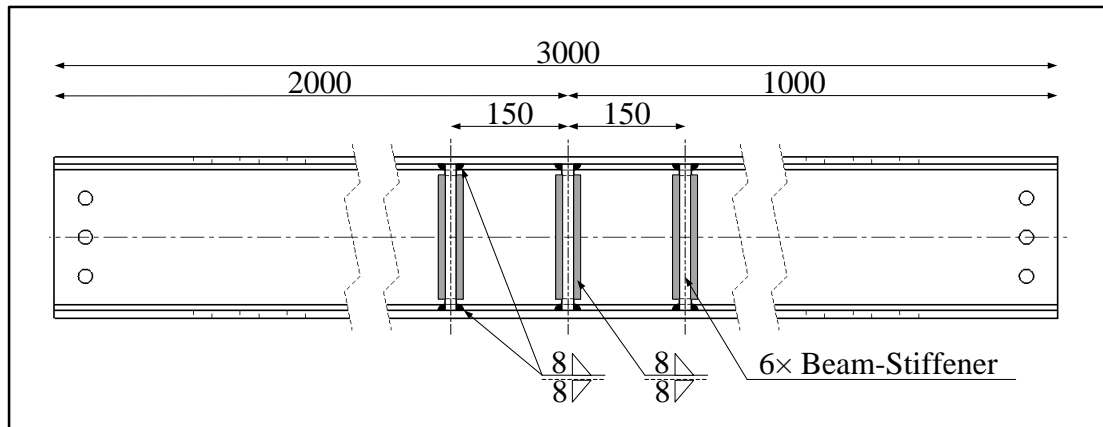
Details of the fillet welds in the column assembly - dimensions in [mm]
